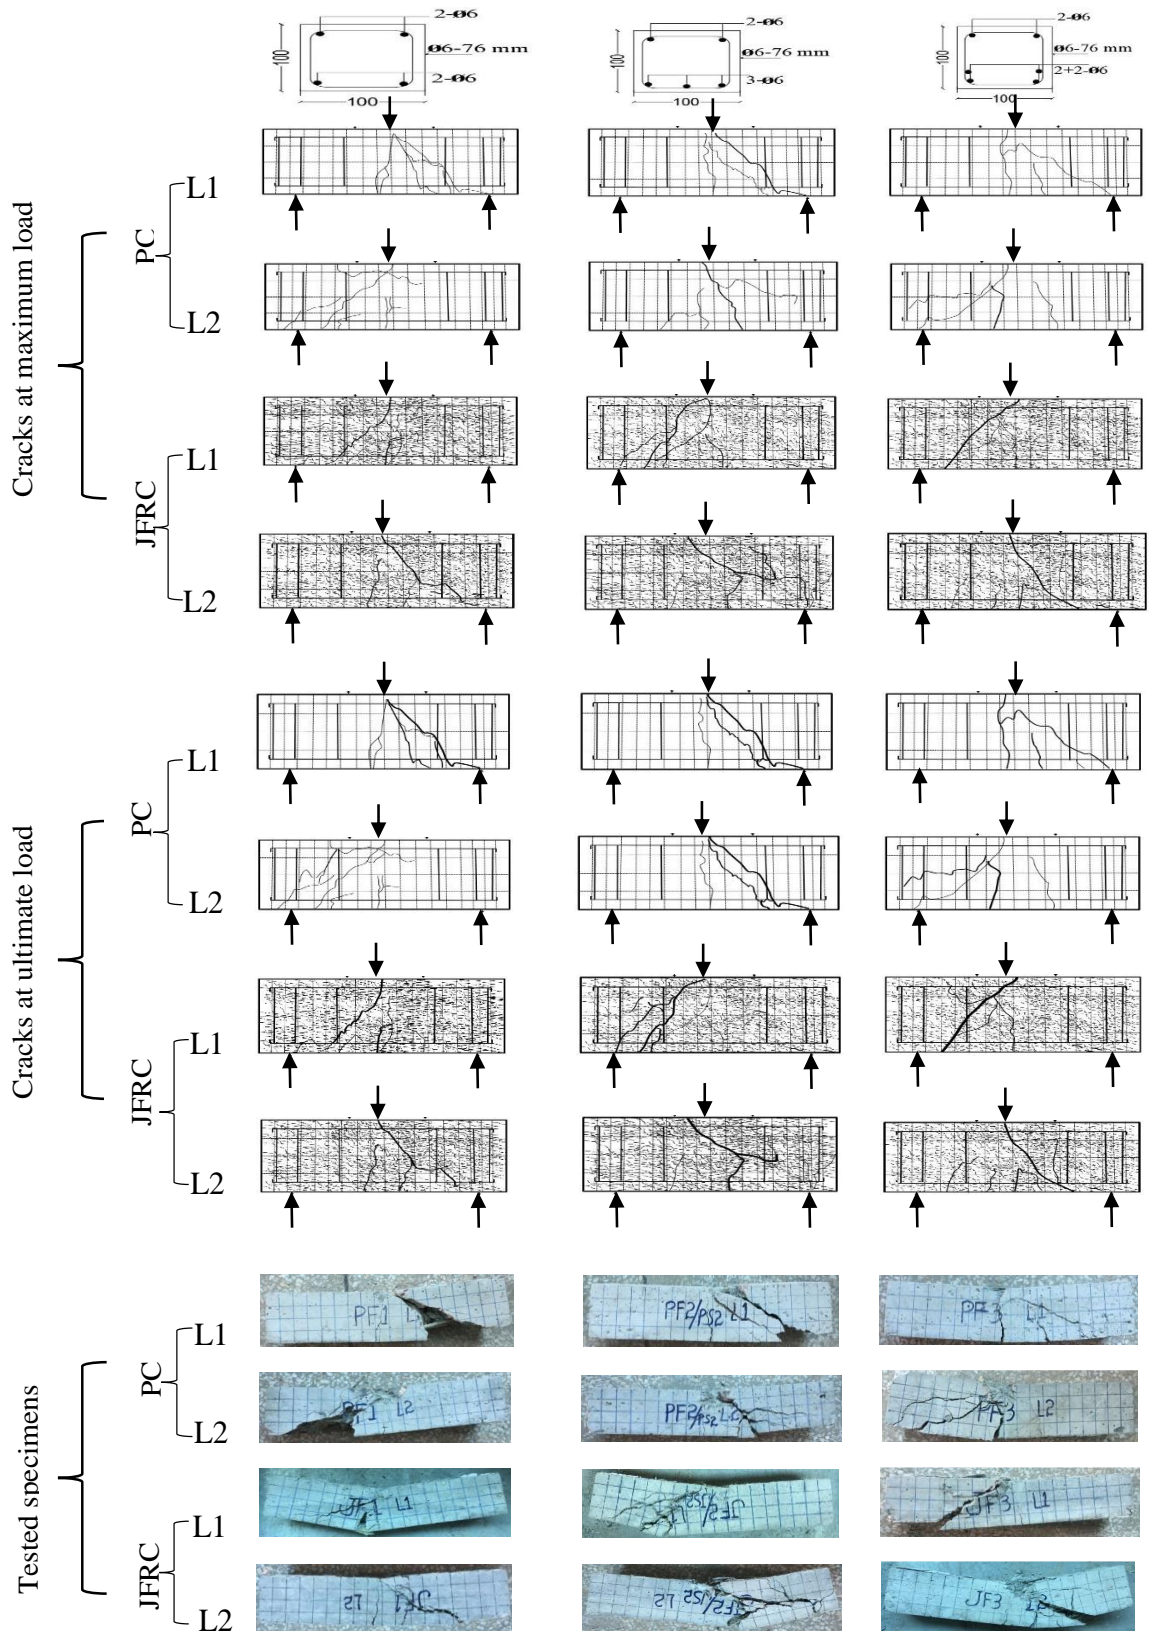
Crack propagation of PC and JFRC specimens with changing flexural rebars and constant shear rebars (i.e. Ø6-76 mm) during varying flexural loading rates.
